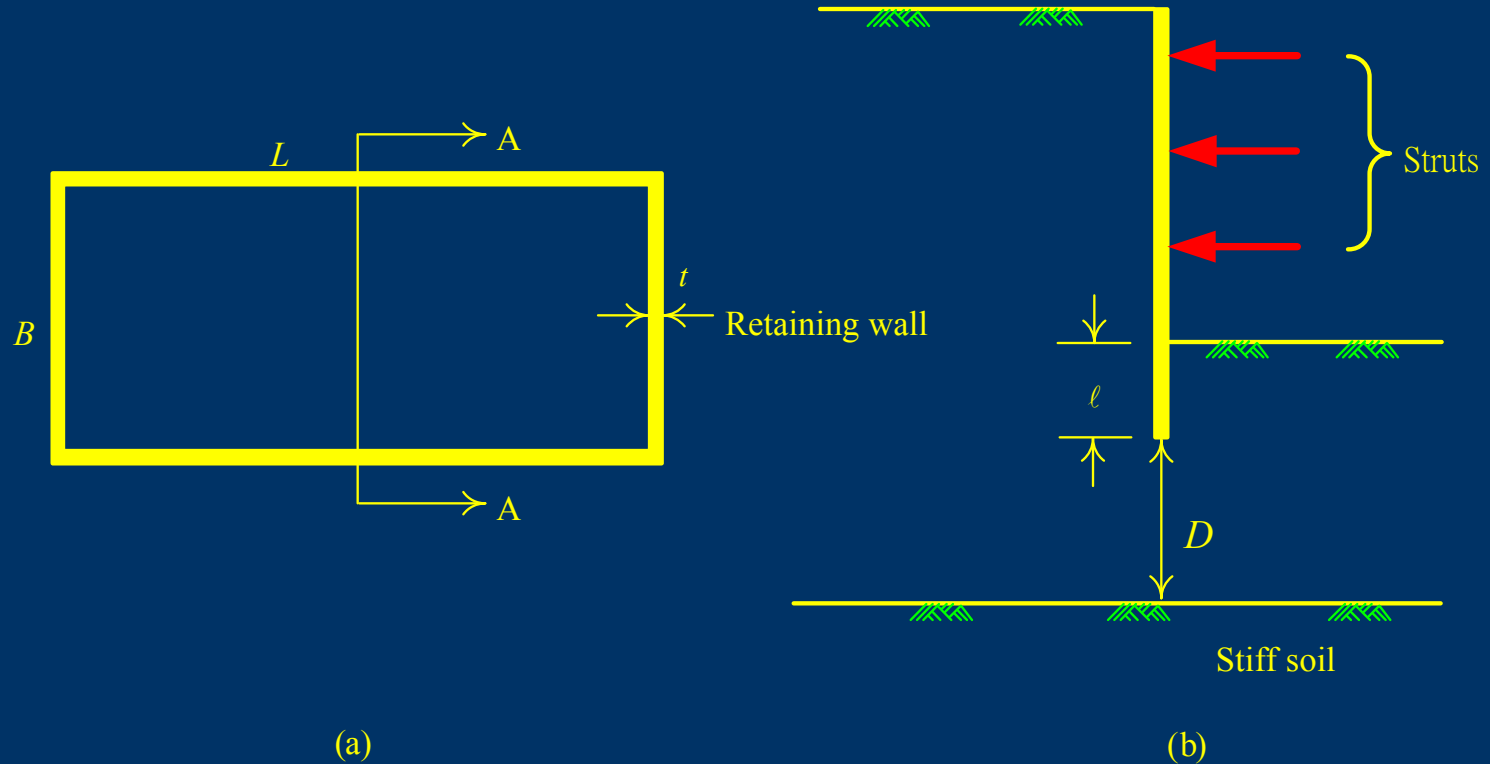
Excavation with the retaining wall ℓ deep into ground
